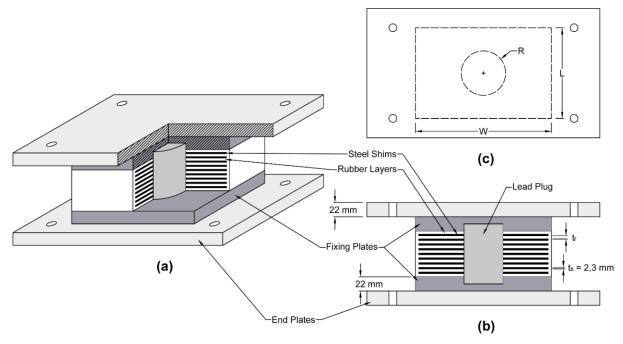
Schematic view of (a) lead-core rubber bearing and its components, (b) Side view and (c) Plan view
